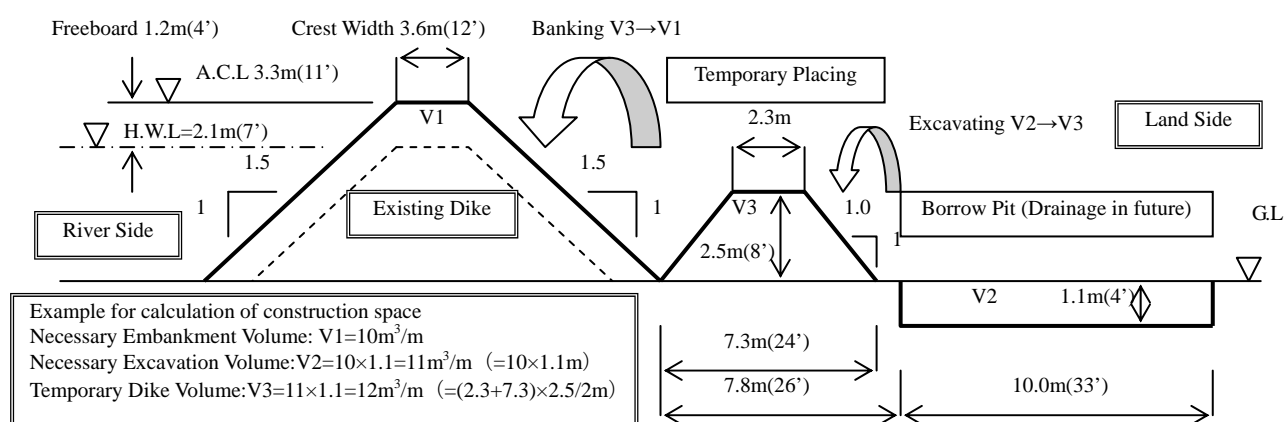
Proposed Typical Cross Section of Dike Embankment
